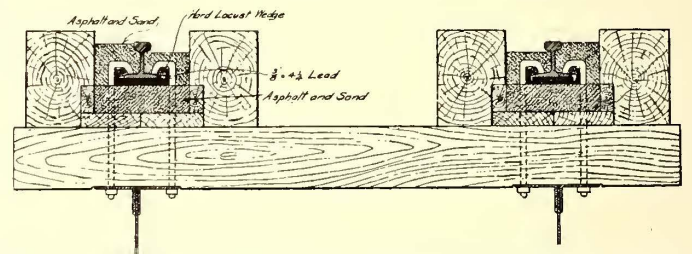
MANHATTAN RAILWAY EXPERIMENT, SHOWING SAME AS FIG. 1, EXCEPT THAT STEEL CHANNELS REST UPON ASPHALT
